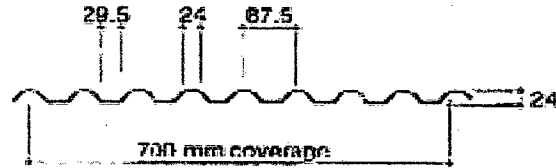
Cross Section of Spandek Profiled Steel Sheeting (all in mm)
